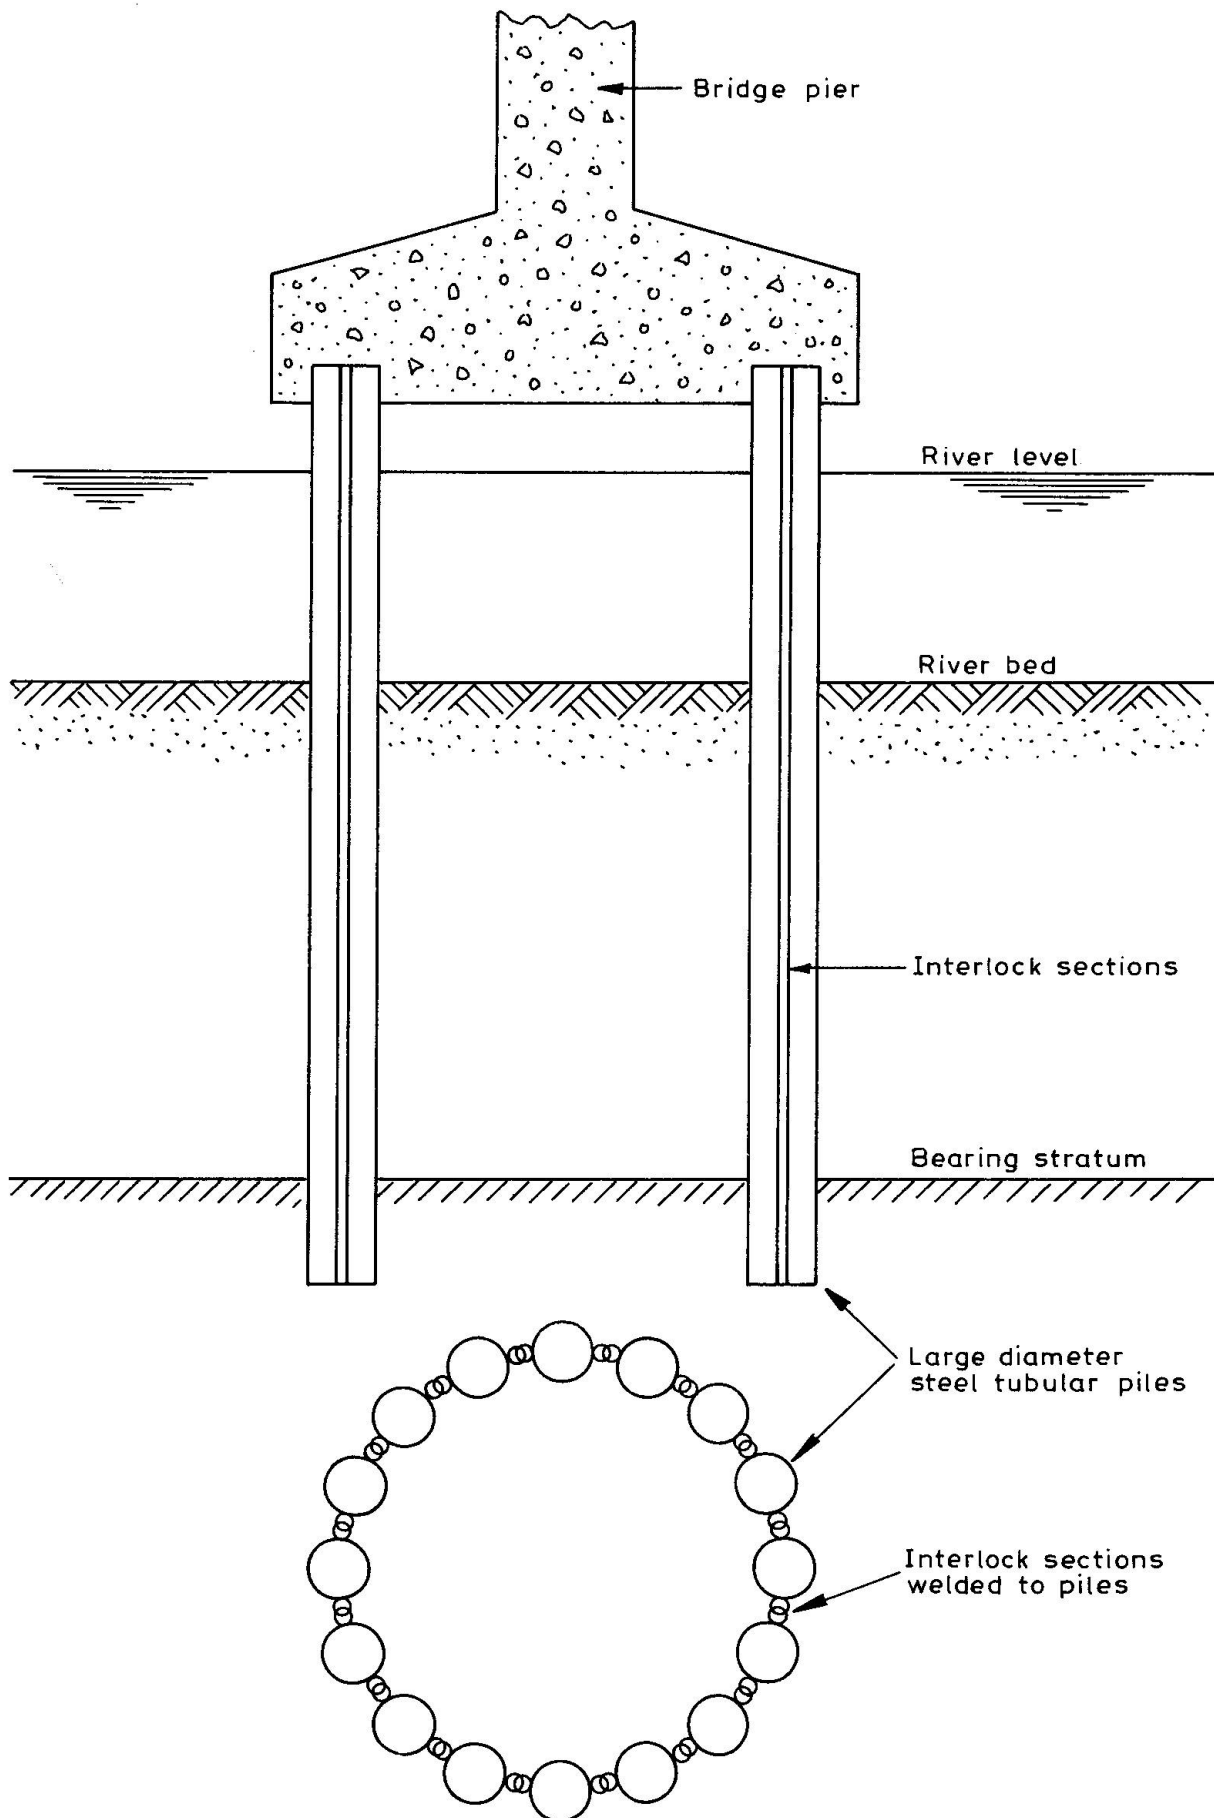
Bridge pier foundations constructed from interlocked steel tubular piles, Japan
